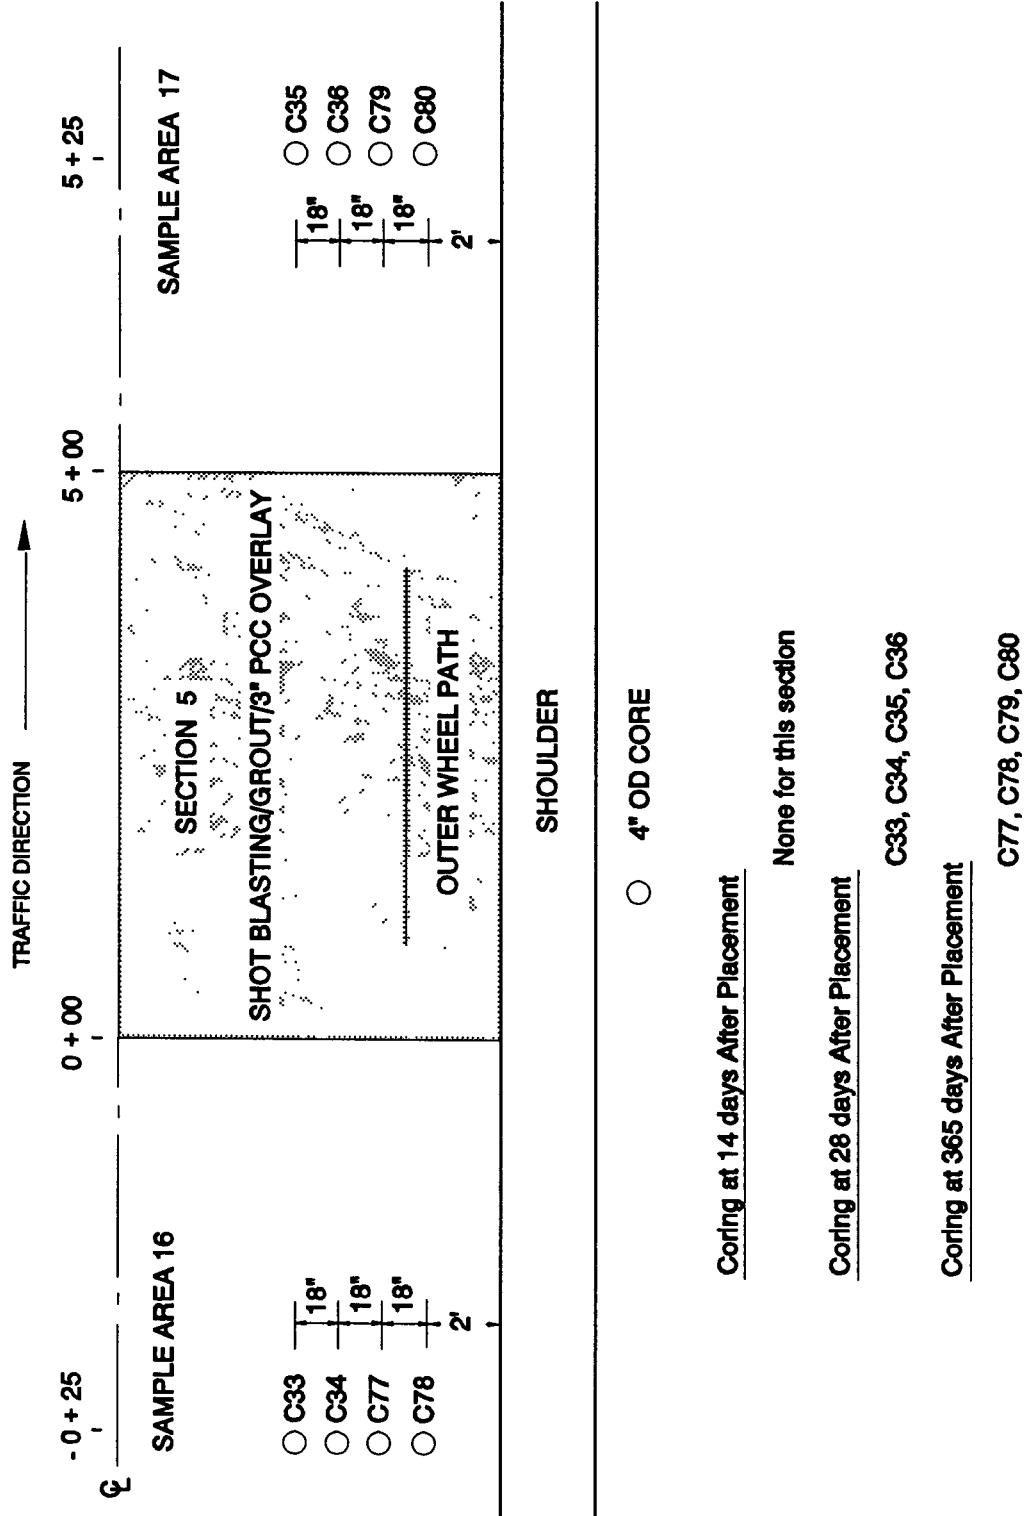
Example of "Post-Construction" Sampling Plan for Test Section 5
